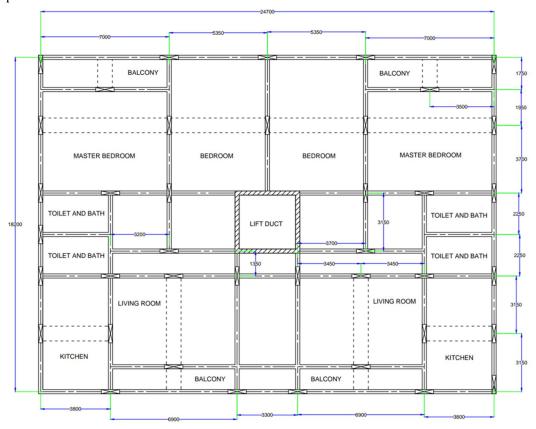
Structural floor Plan (Source: Autocad Software)
